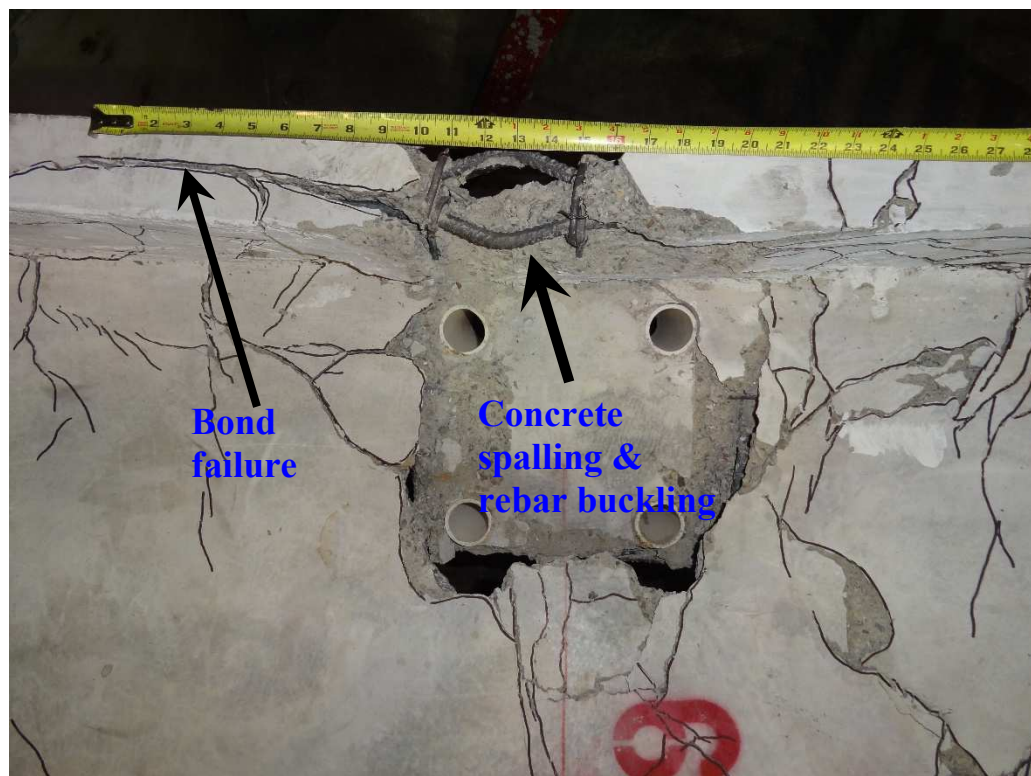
Concrete spalling and rebar bond failure at push location during test at beam edge on specimen 2.
